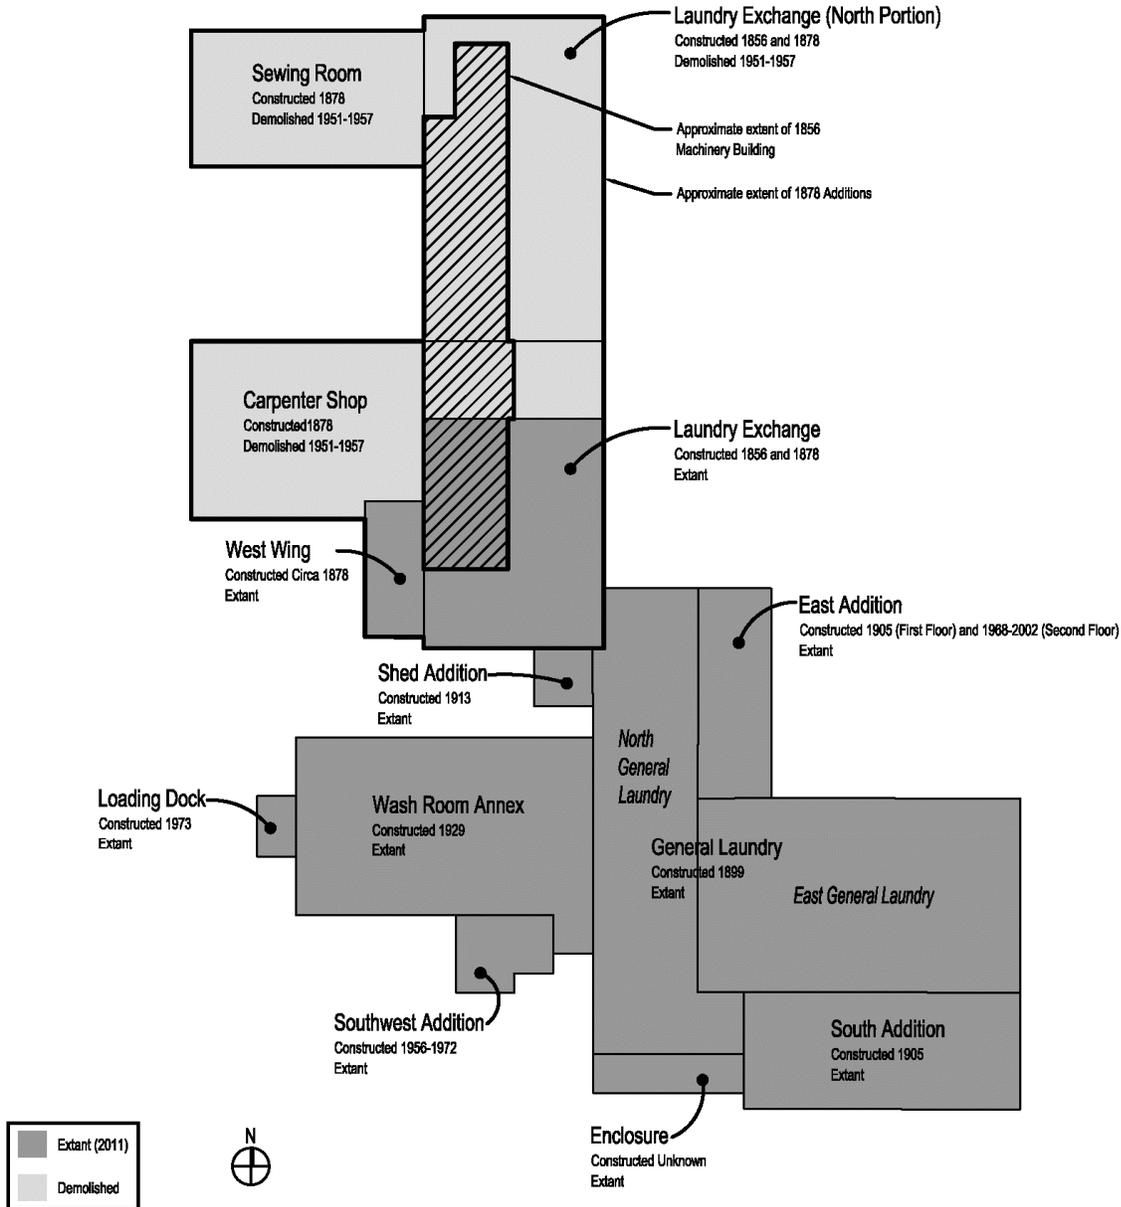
Source: Historic Structure Report: Construction Shops (Buildings 49)
